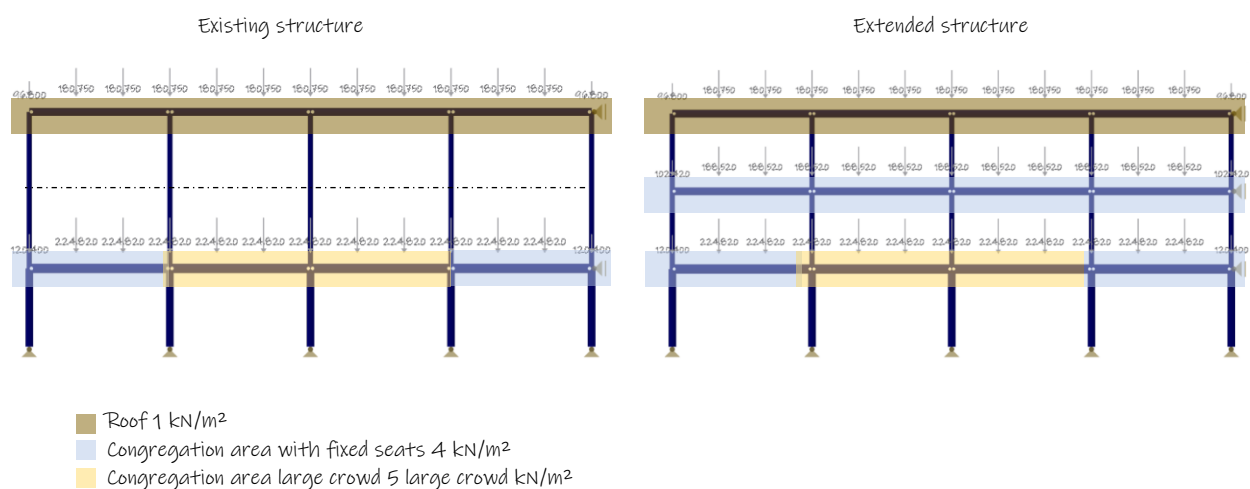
The existing scalable design structure and original loads (left) contrasted with the extended structure and updated loads (right). A detailed legend for clarity (bottom).
